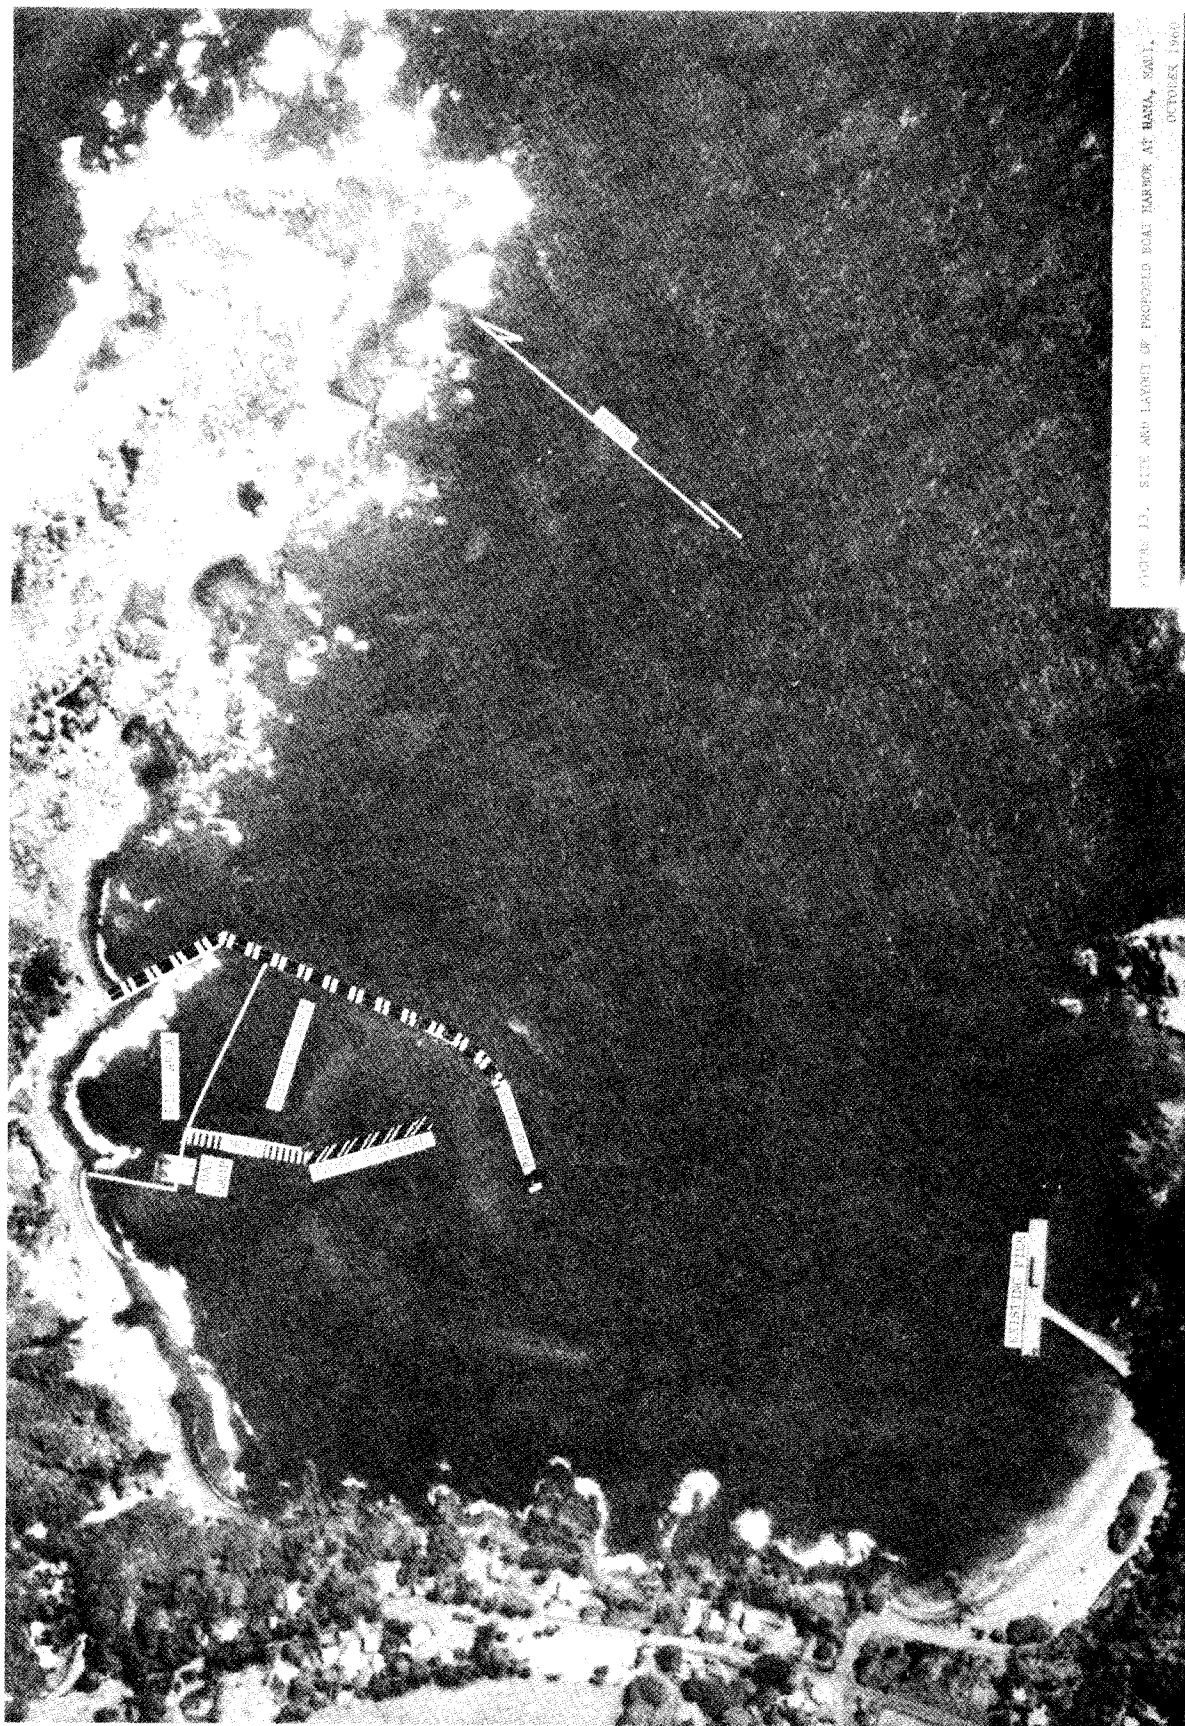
SITE AND LAYOUT OF PROPOSED BOAT HARBOR AT HANA, MAUI,
